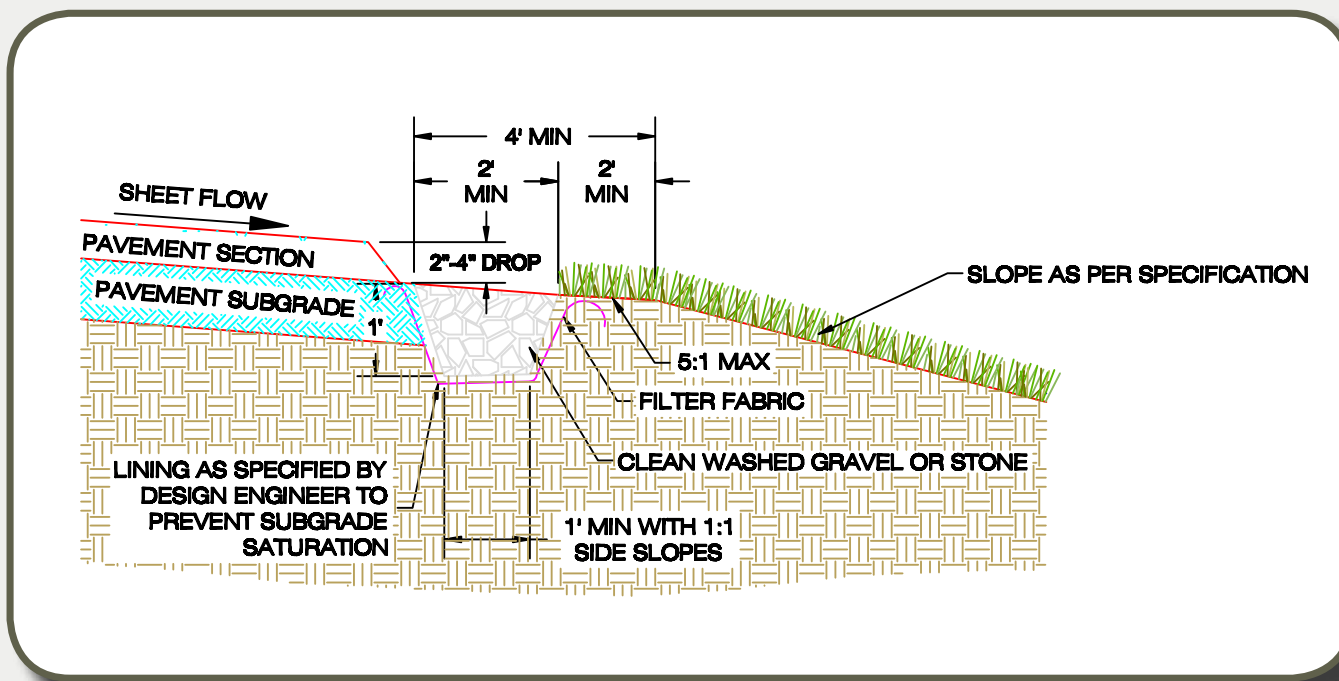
Sheet Flow Gravel Diaphragm Pretreatment to Filter Strip or Conservation Area – Typical Section
